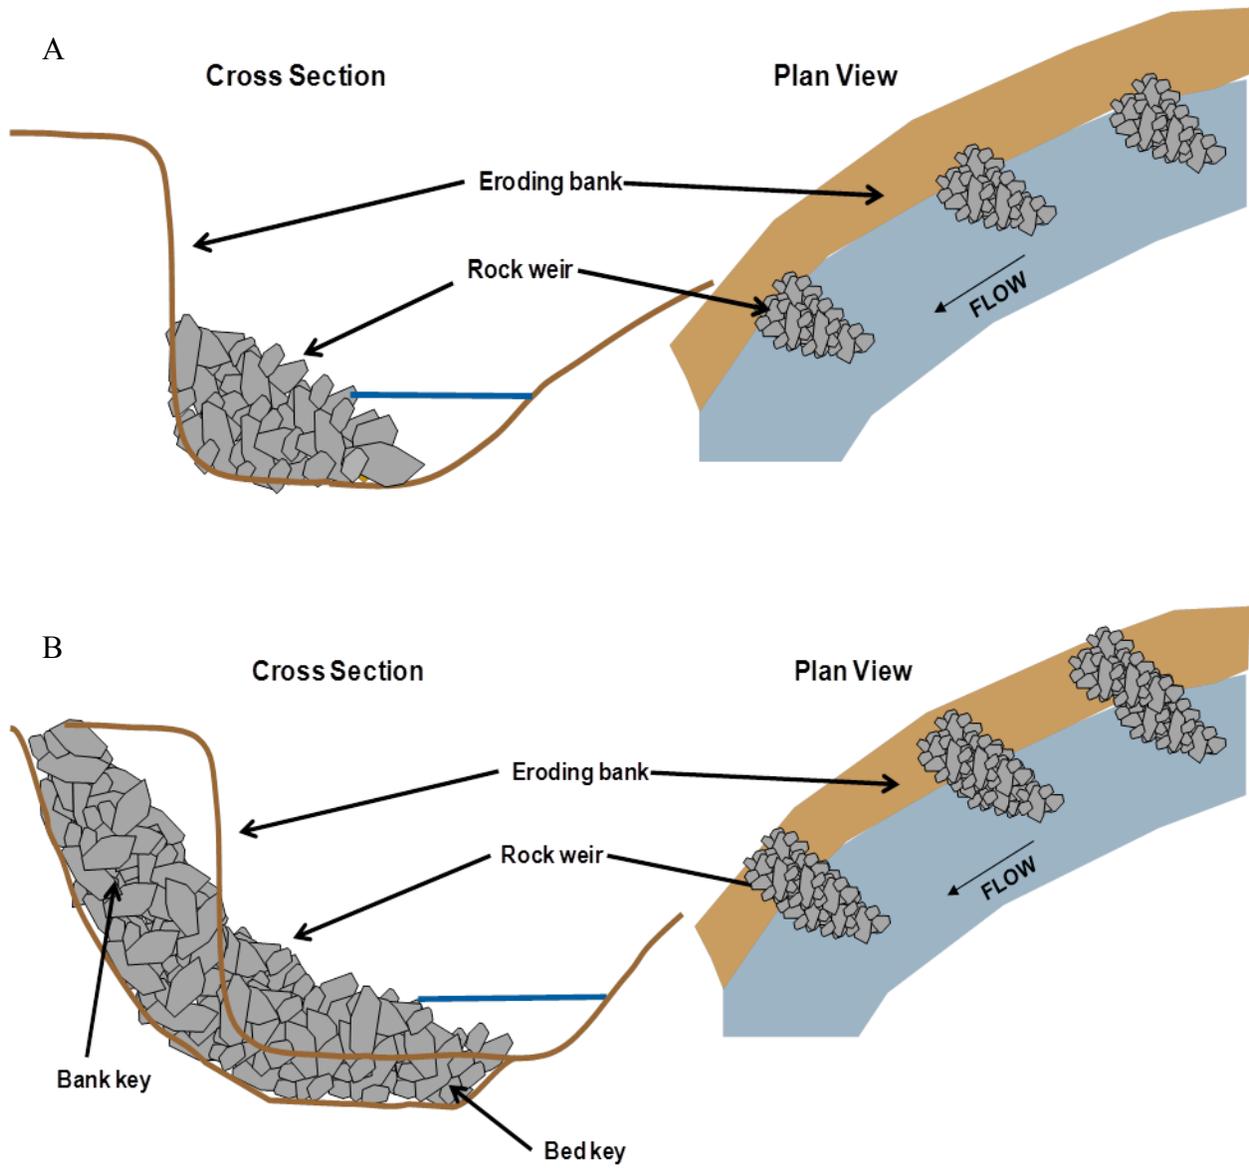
(A) Cross section and plan view of a generic experimental farm rock weir project. (B) Cross section and plan view of a generic traditional bendway weir project.
